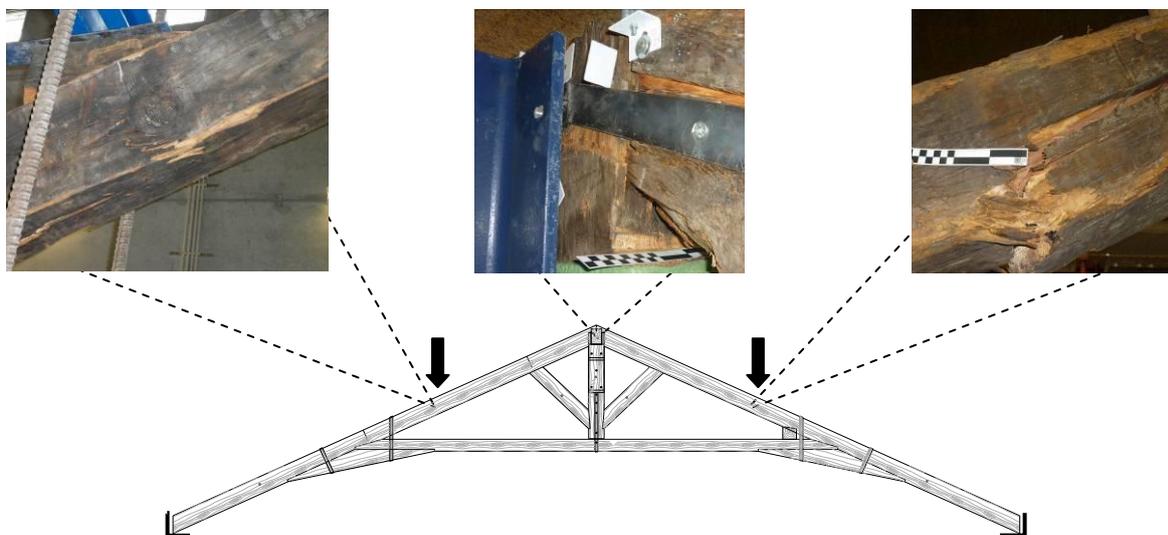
Schematic of test setup and details of the failure of the rafters and of the post-rafter connection
